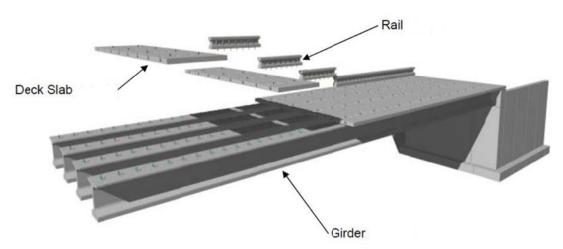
Components for Typical Substructure and Superstructure Construction (reproduced with permission from PCI).
